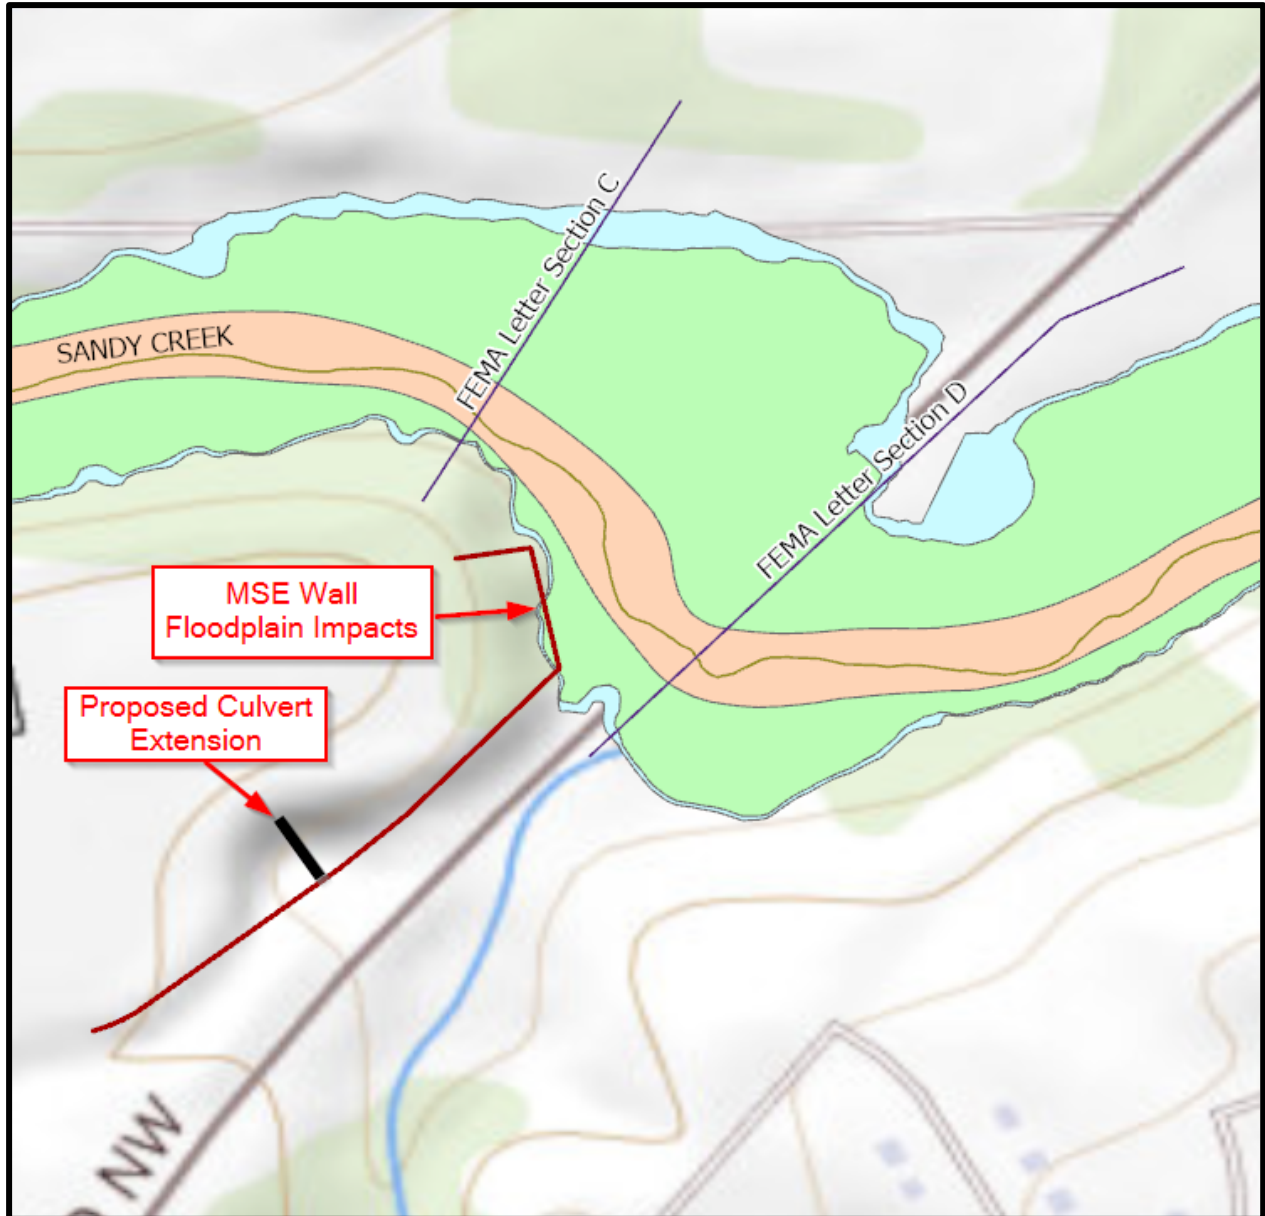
Proposed Project Impacts with FEMA Floodplains
